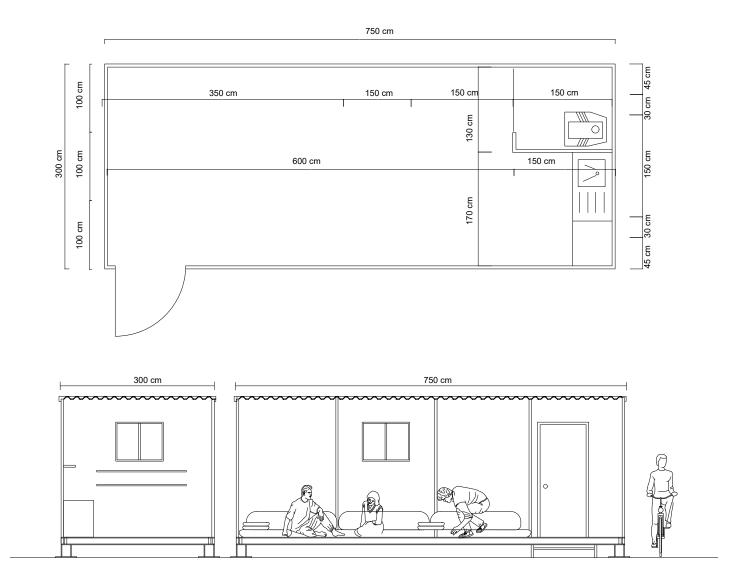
Caravan with washroom inside- plan and sections [Illustrated by Author]
